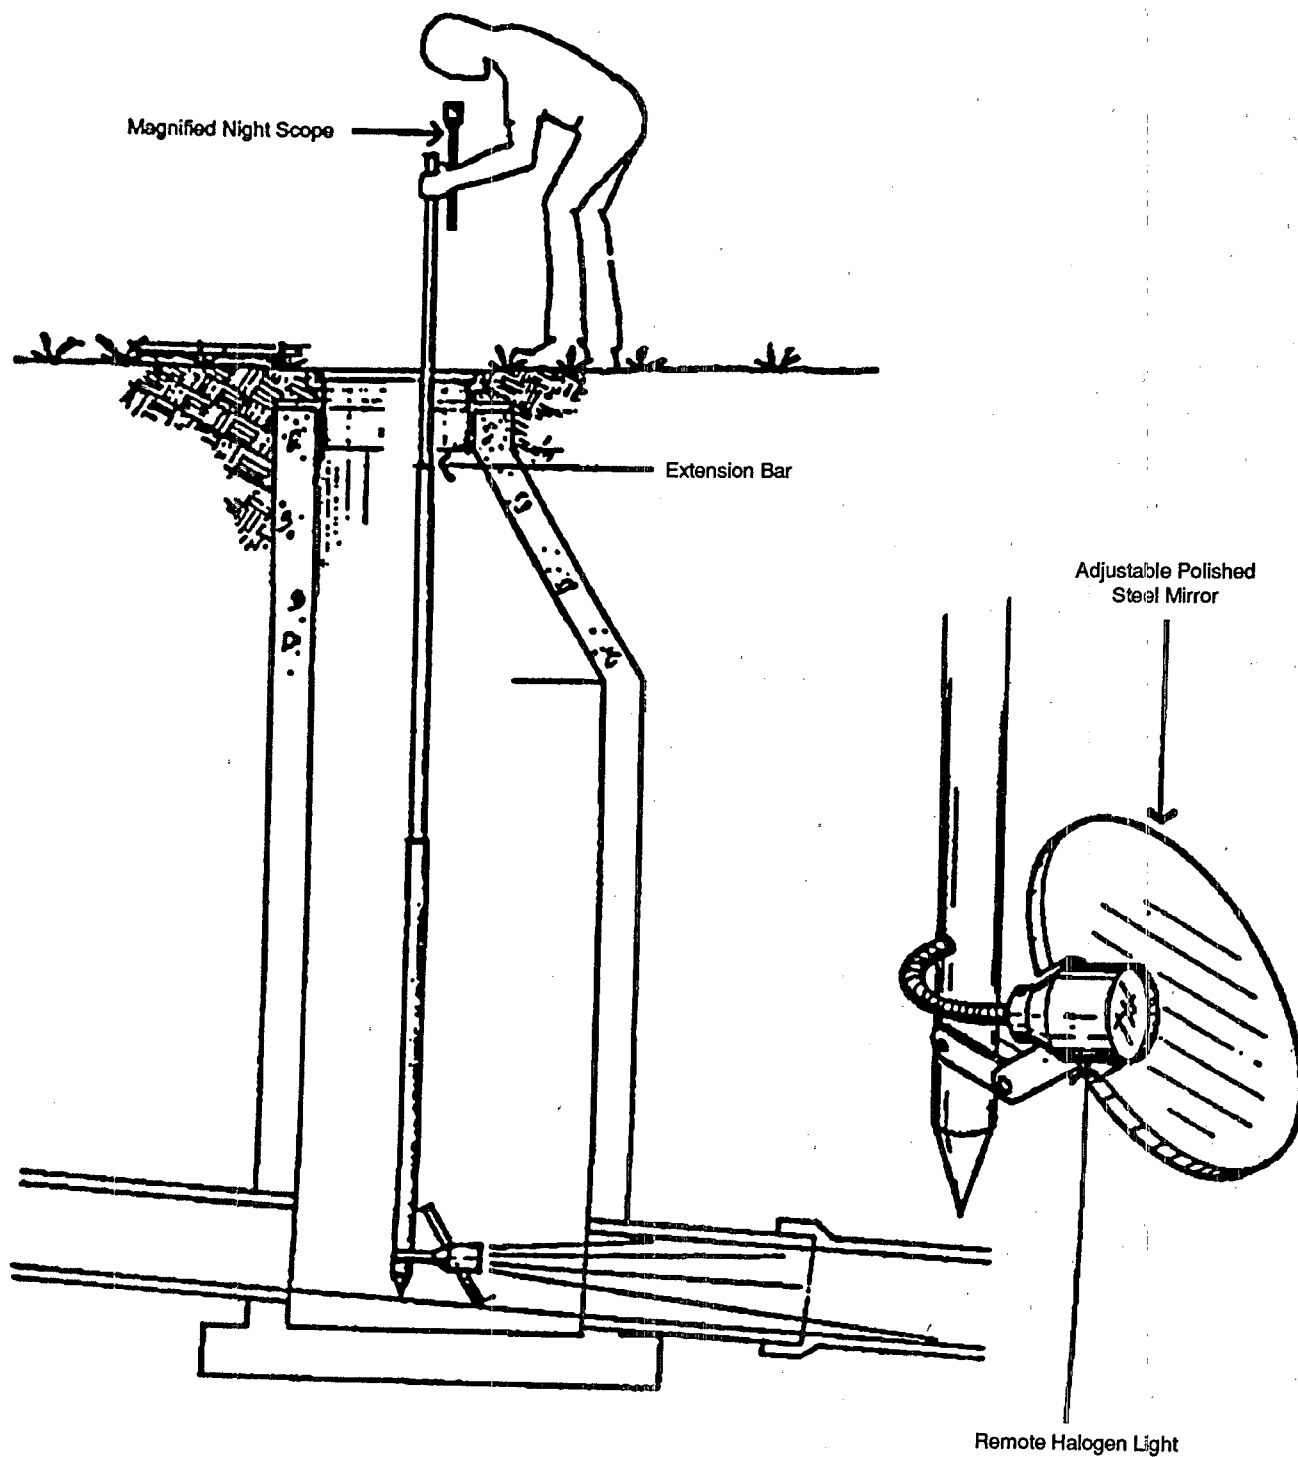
Quick method of inspecting sewer lines.
